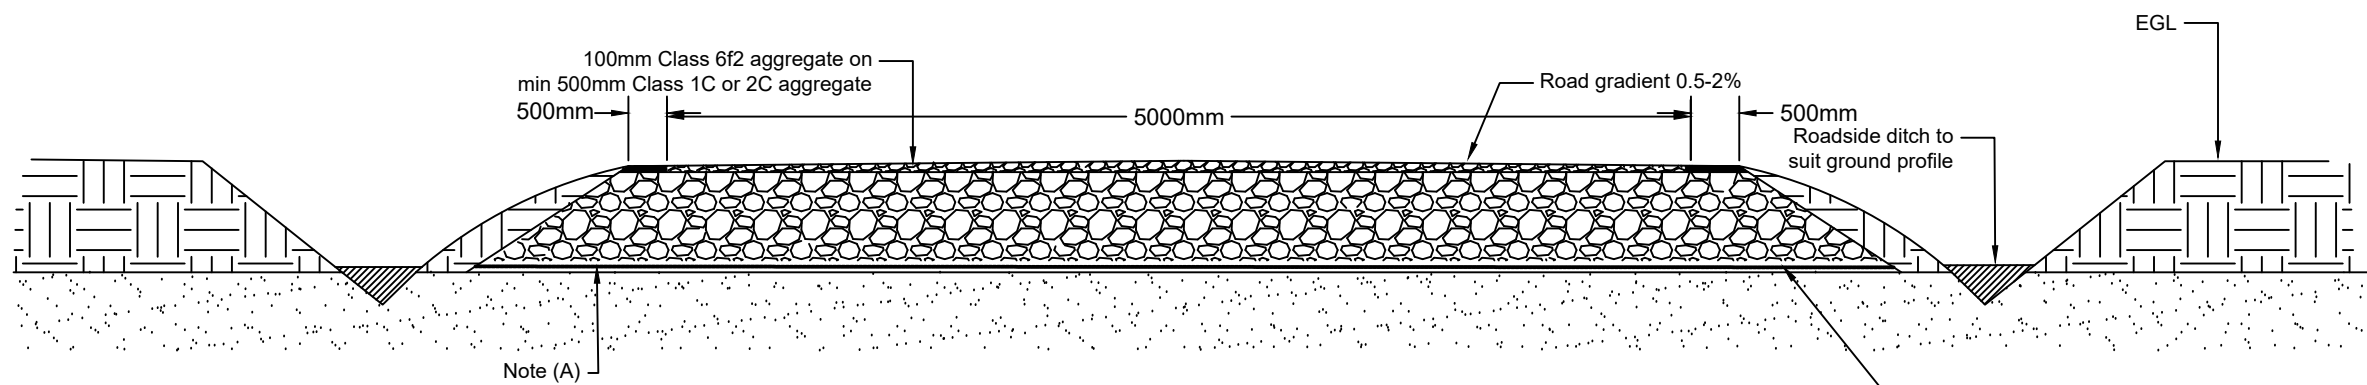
Typical Foundation & Crane Hardstand Design
